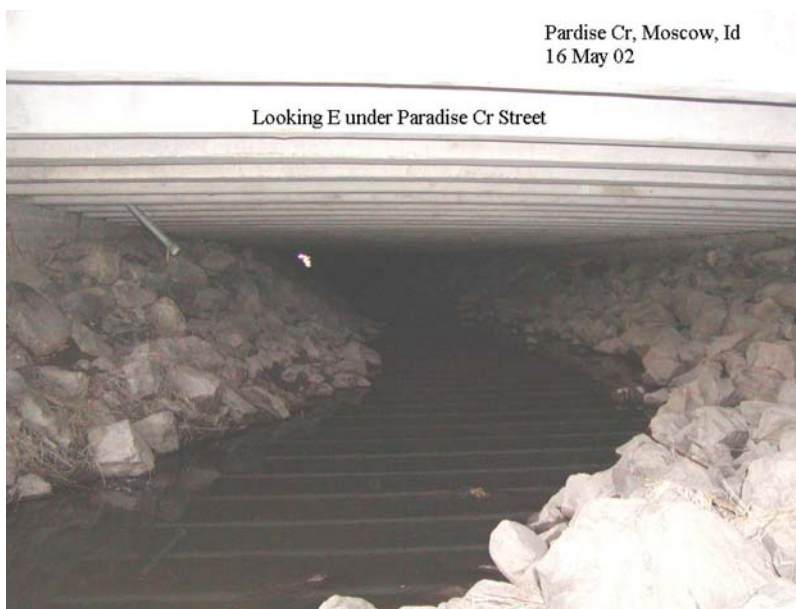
Paradise Creek under Paradise Creek Street (looking east, upstream)
